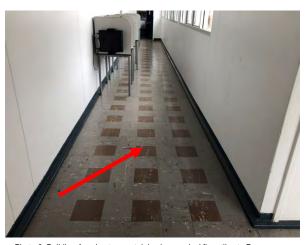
Building A, asbestos containing brown vinyl floor tiles to Room R1010
